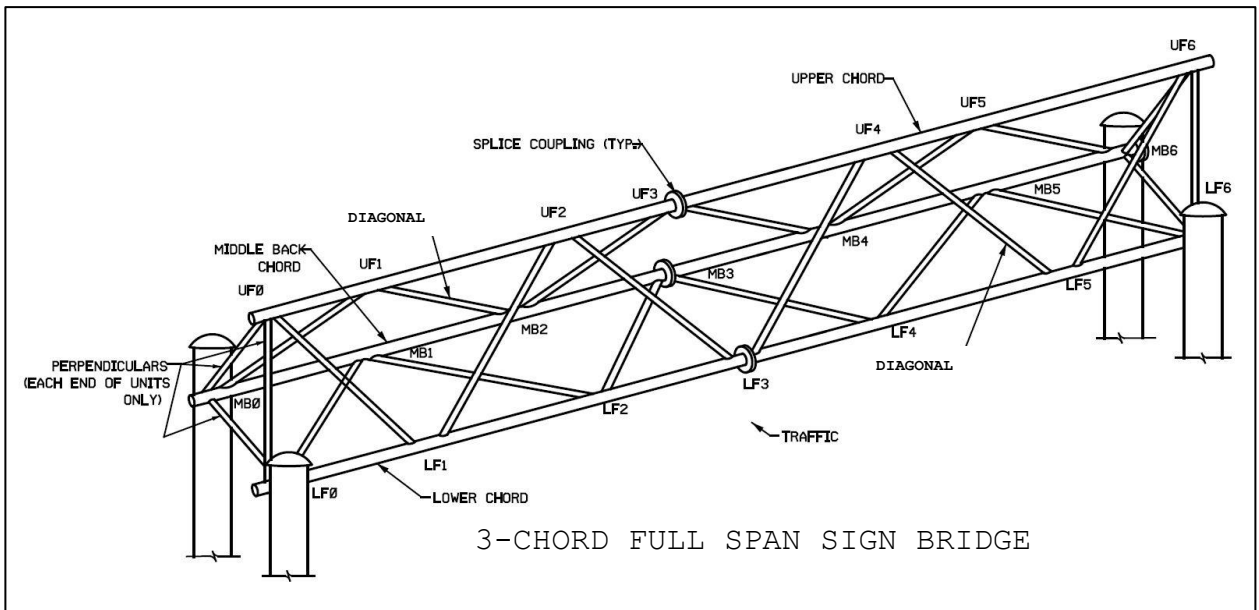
Typical Inspection Numbering System for 3-Chord Full Span Sign Bridge.
